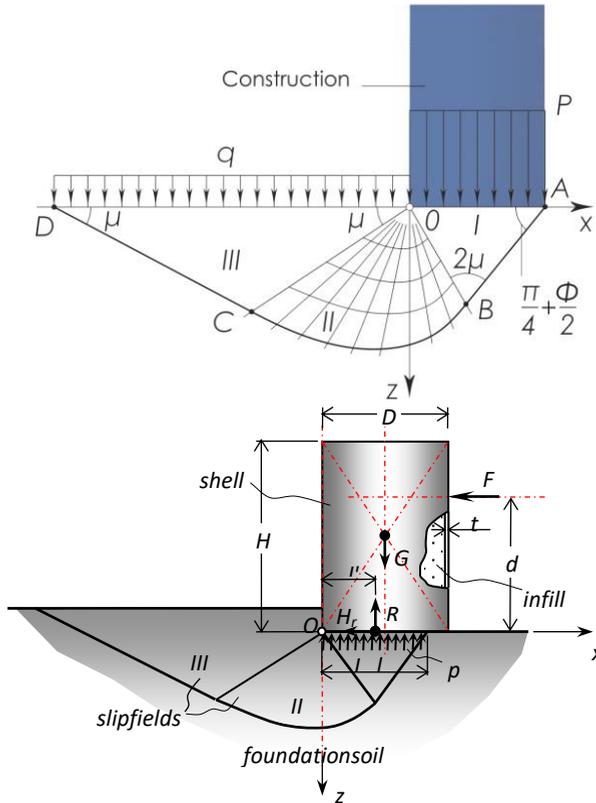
Illustrations for theoretical model: a – sliding areas formation pattern; b – loads and pressures on the structure for stability calculation.
